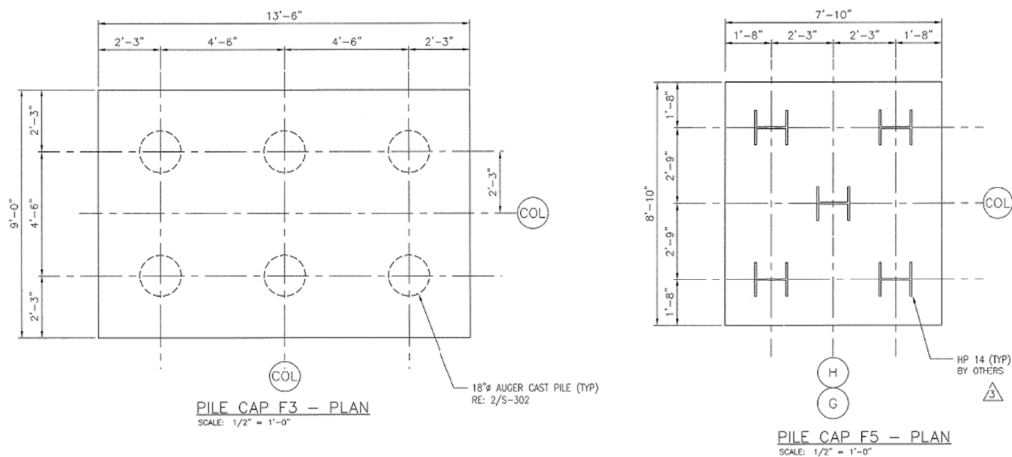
Typical 18" auger cast pile cap (left) and typical steel H pile cap (right)
